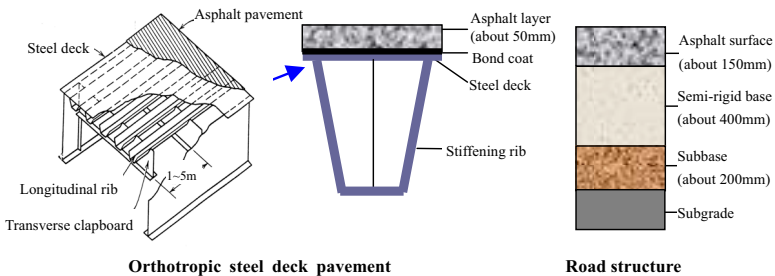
Difference between the Orthotropic Deck Pavement and Road
